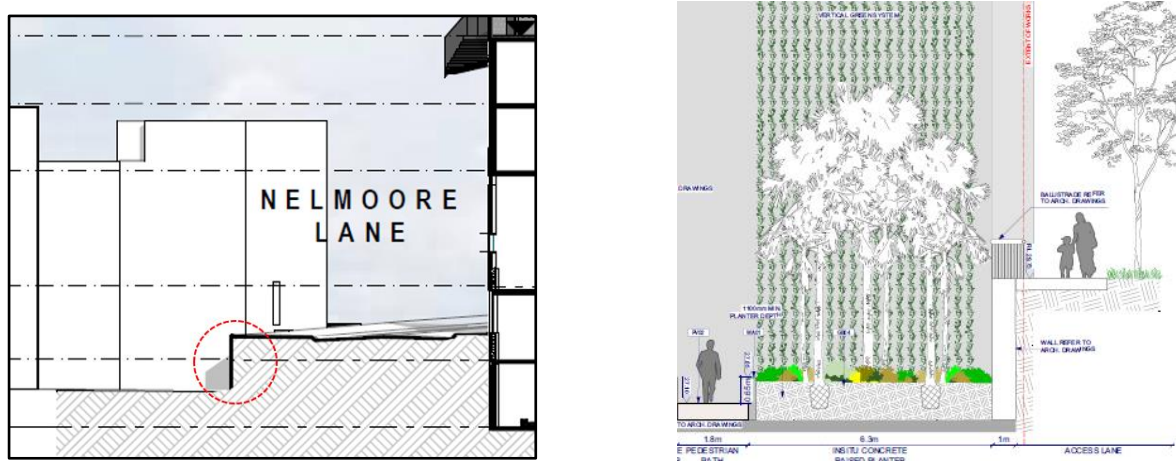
PLN17/0703 Architectural Plans Drawing No. TP-503 (left) and PLN18/0173 Aspect Studio Landscape Plans for Artisan East- M17038-LA-702 (right)
